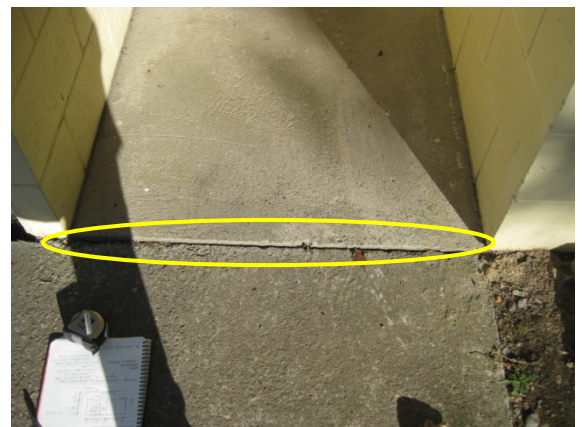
Differential Movement between the Concrete Floor Slab and Concrete Path outside Ladies
